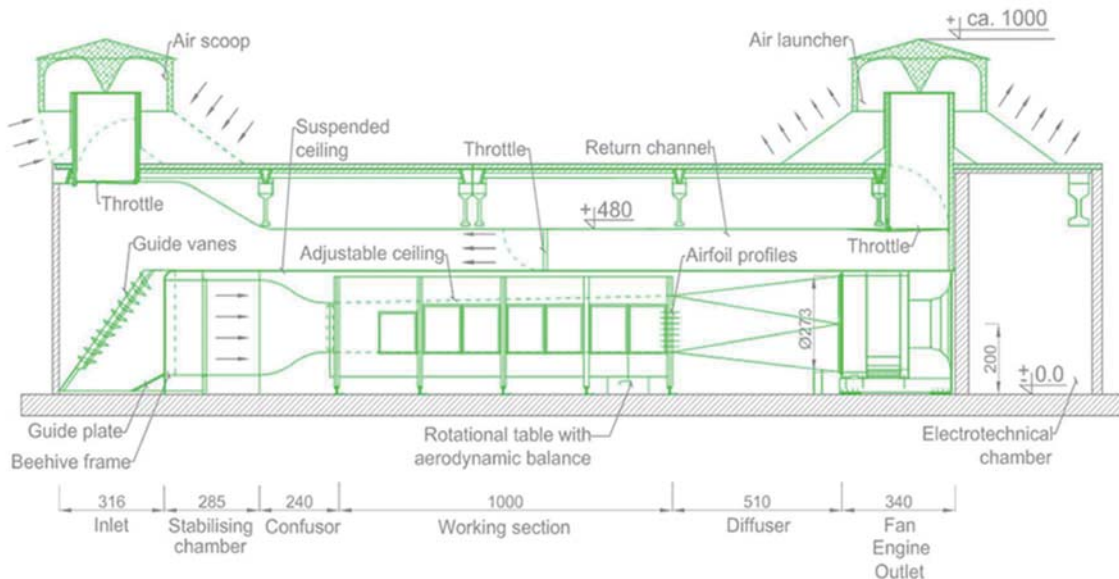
Longitudinal cross section of Wind Engineering Laboratory of Cracow University of Technology wind tunnel (all dimensions in [cm]).
